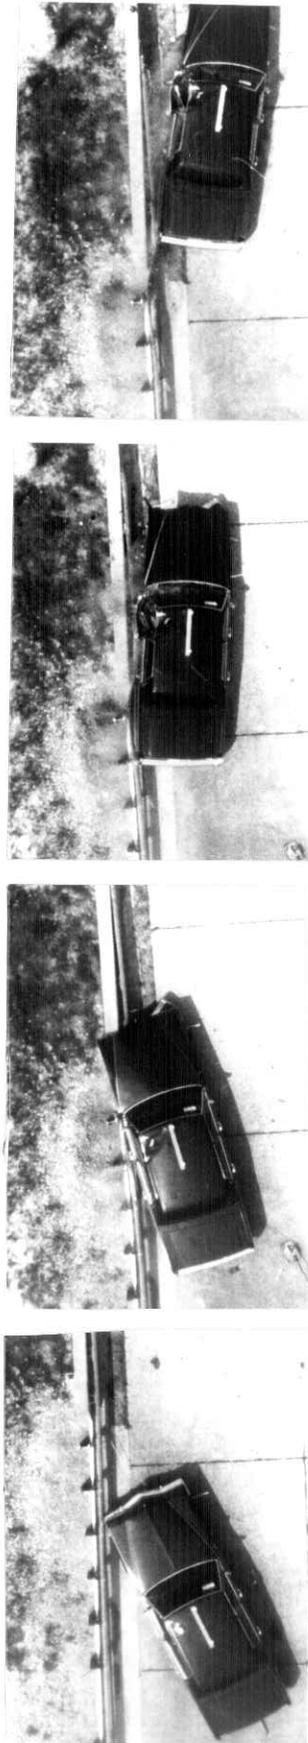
Arizona guardrail transition to concrete barrier after test 7155-6.
